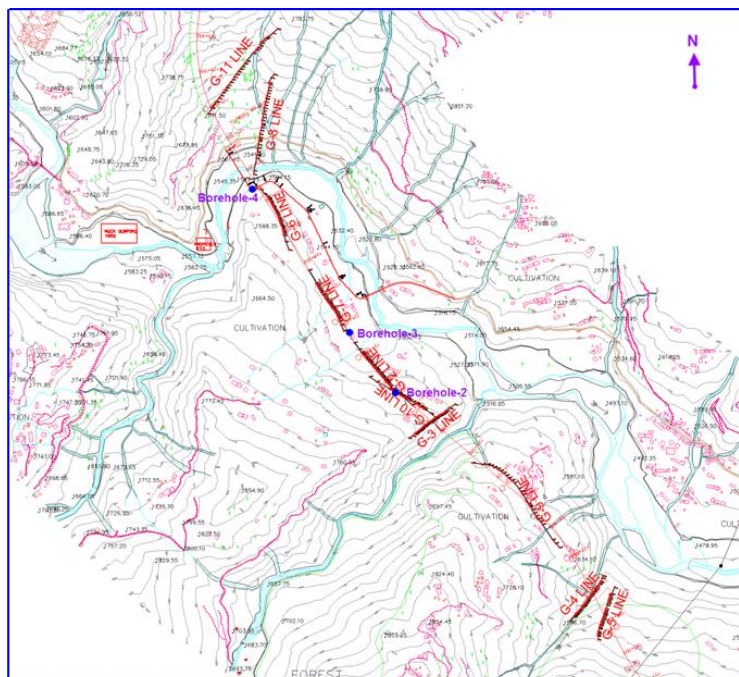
Part plan showing south portal to tunnel T-74R
